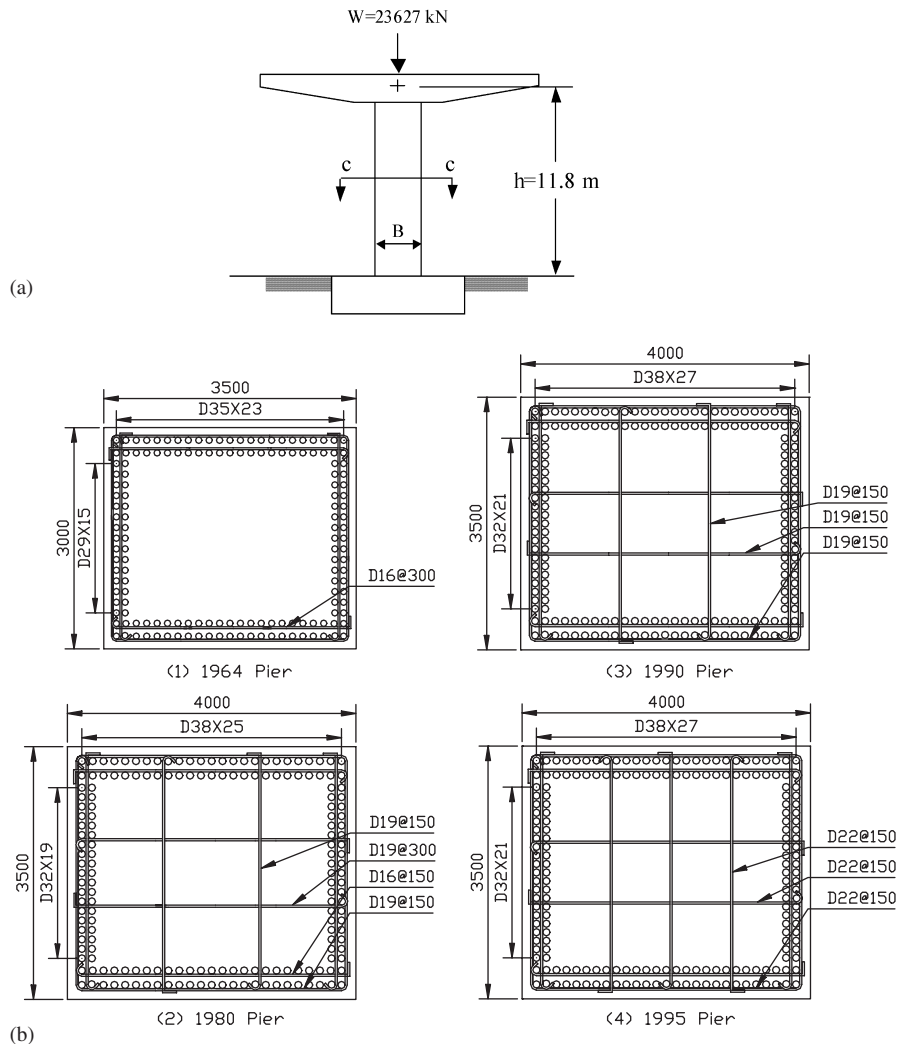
Elevation and sectional views for the four typical bridge piers used in this study.
